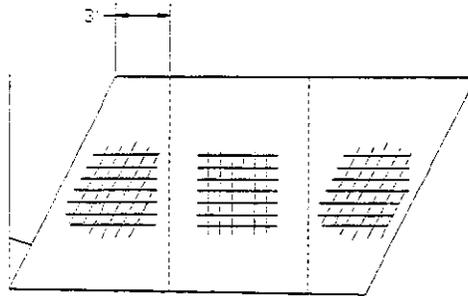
Reinforcement layout for skewed isotropic deck for skew angle $> 70^\circ$
